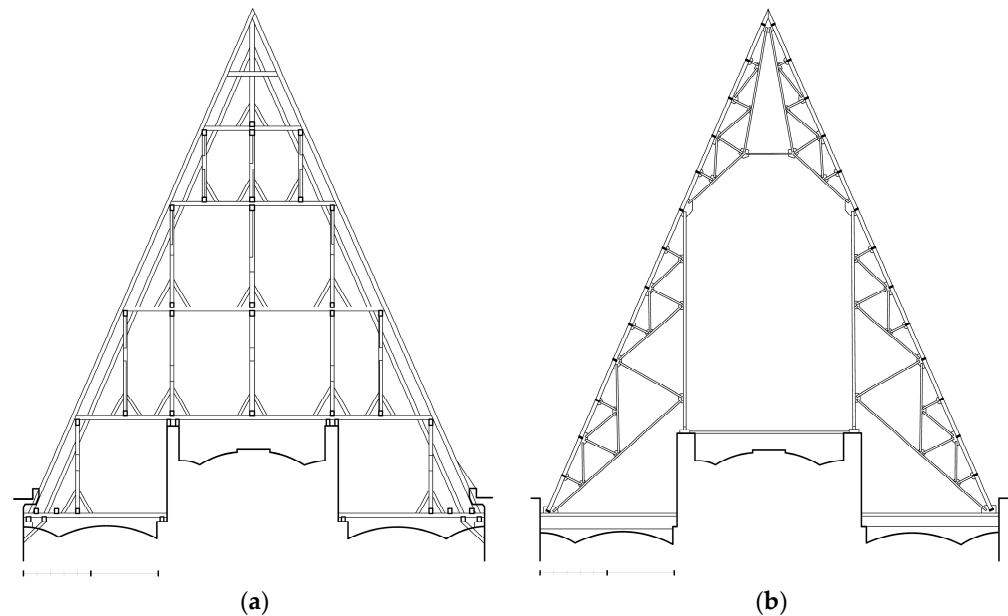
St. Stephen's Cathedral: (a) original roof structure; (b) structure after reconstruction.
